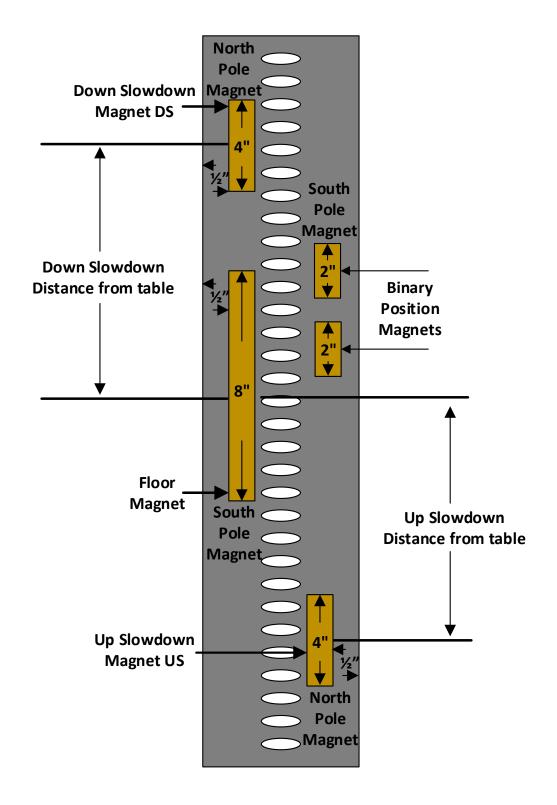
Selector Magnet Placement (GALX-1011BN board) With Binary Presets
